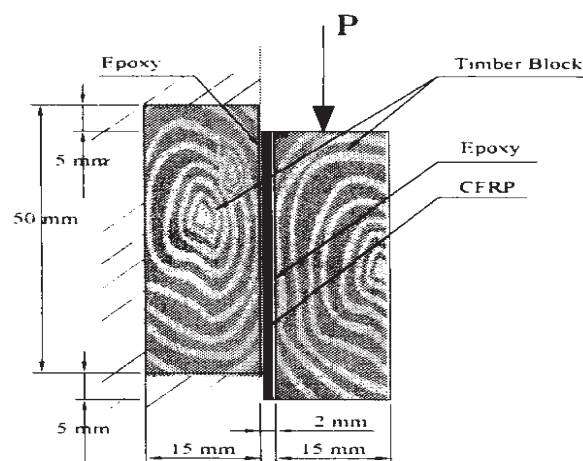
Side elevation of a typical test specimen (Crews and Smith 2006)
